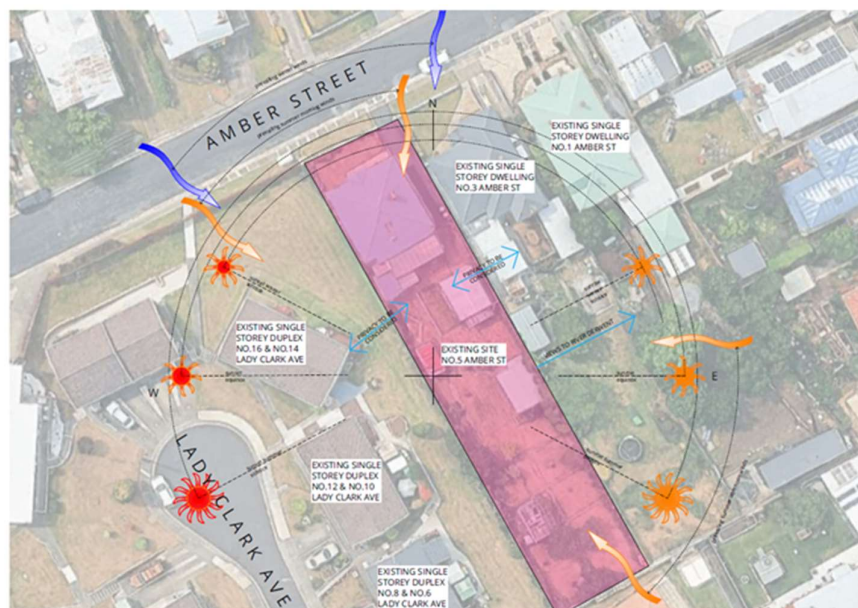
Site Plan (Source: SDA, Amber Street NDIS Housing)
